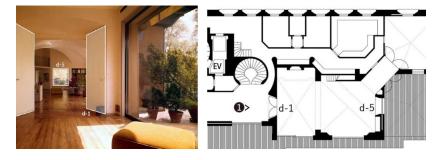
Interior view and enlarged 4FL plan of Casa Pirelli.
